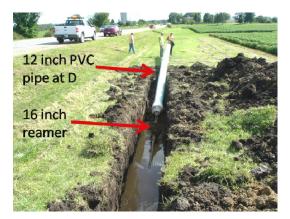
PVC pipe (12-inch diameter) being pulled into borehole from point D with a 16-inch diameter reamer leading
